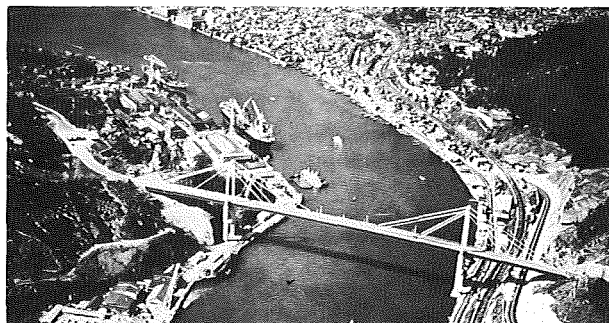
Ludwigshafen Bridge, aerial view. (Courtesy of Der Stahlbau, from reference 13.)
